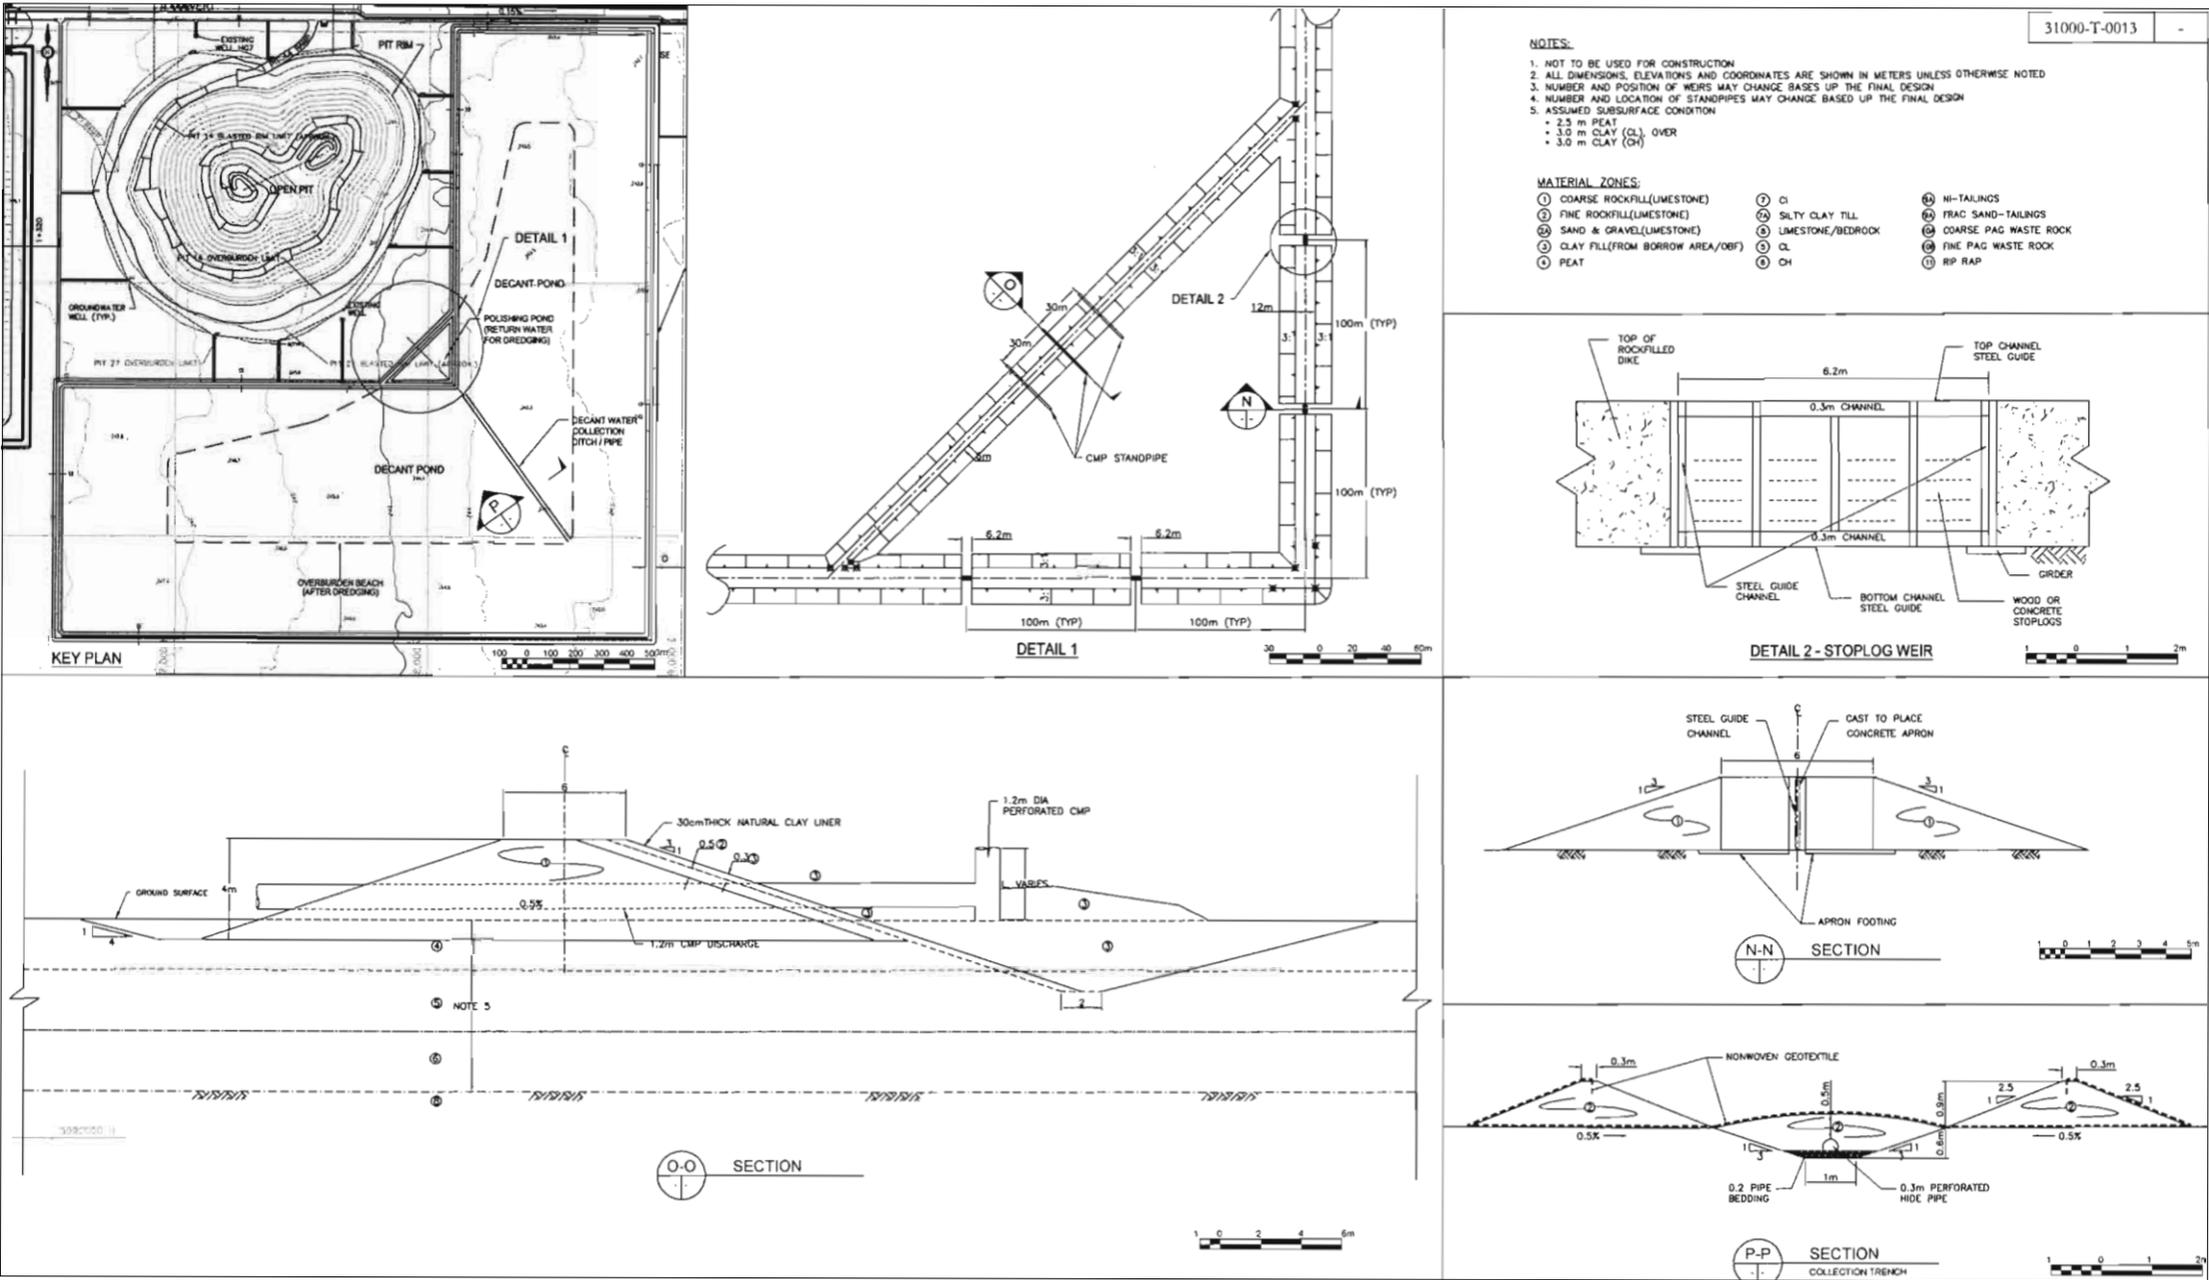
ODF Water Management Structure Plan and Sections
